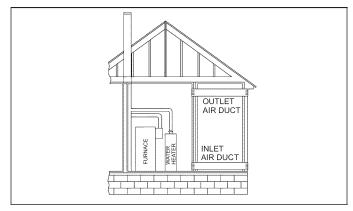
Horizontal Air Inlet, Outlet and Chimney Connections
